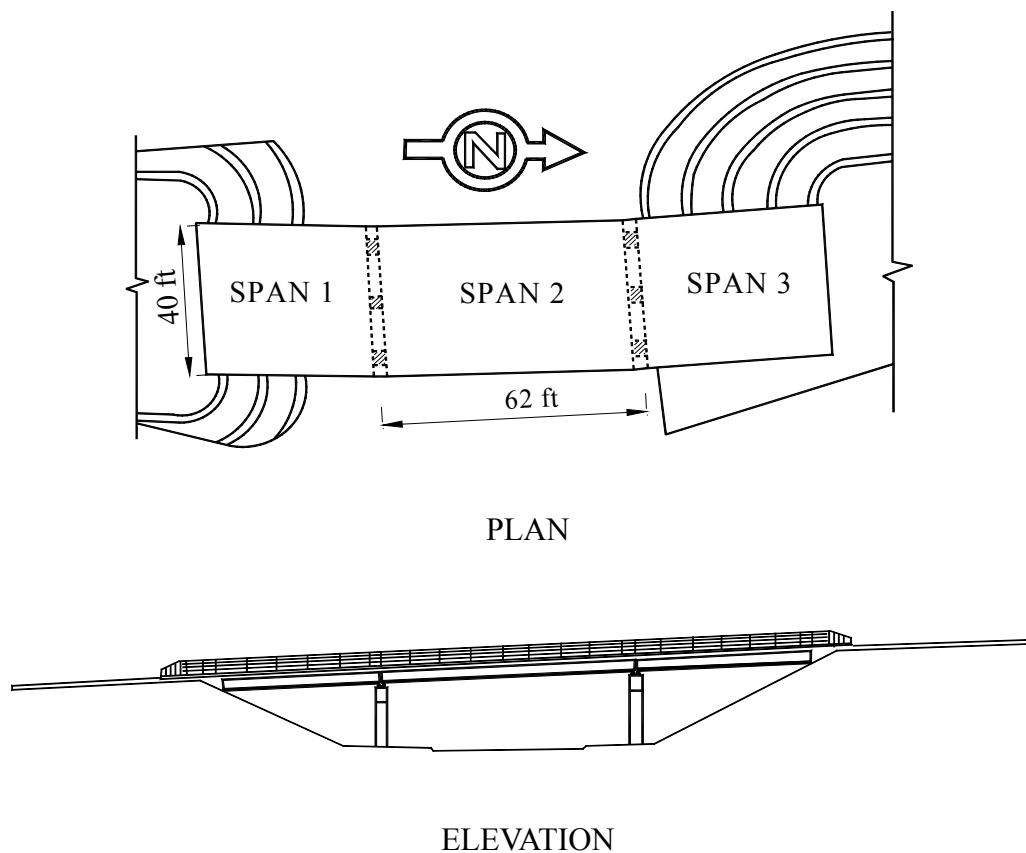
Plan and Elevation of the Typical Highway Bridge.
